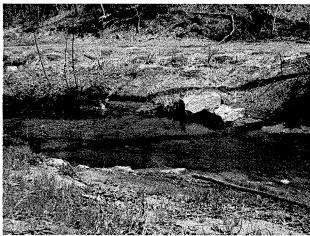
Downstream face of culvert installed at upstream end of project area. (9/27/04)
